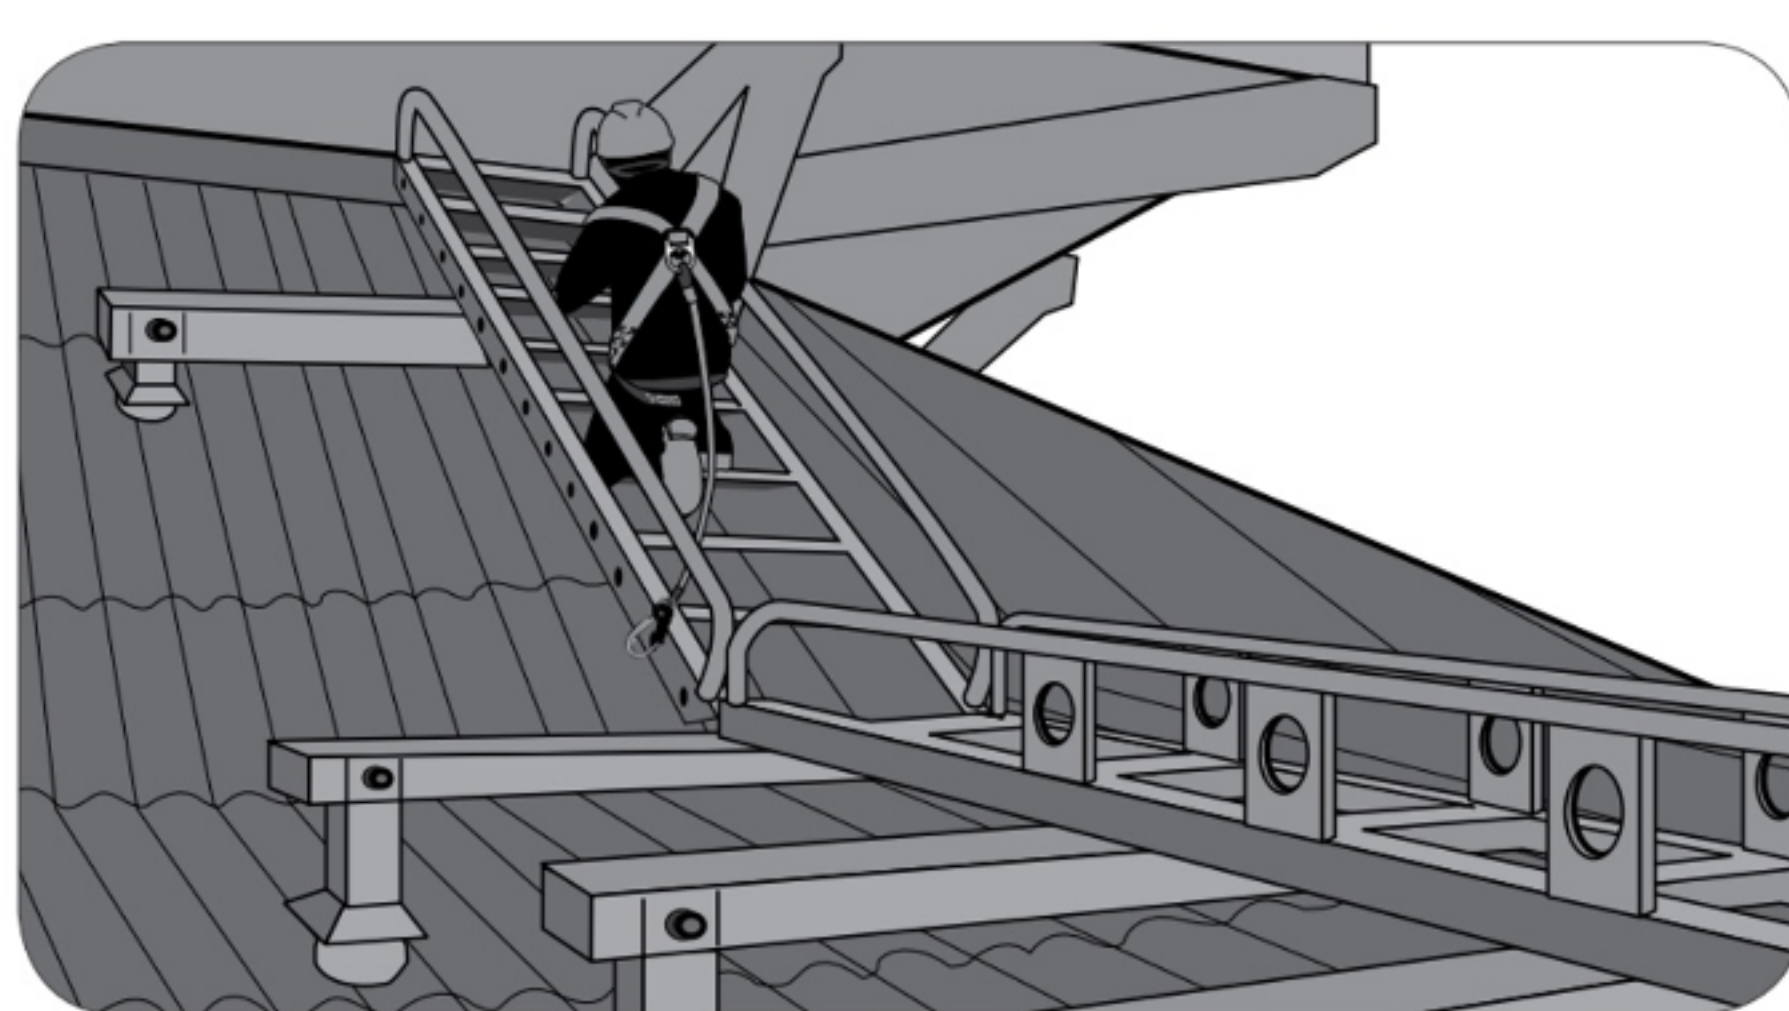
Example of a roof ladder and gangway on a sloping roof.
